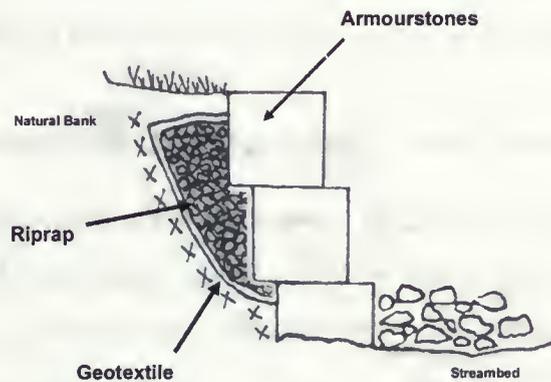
Diagram depicting the cross section of the restored armourstone wall at Forty Mile Creek in Grimsby, Ontario. A larger volume of riprap seems to have placed in behind the new armourstone wall.
